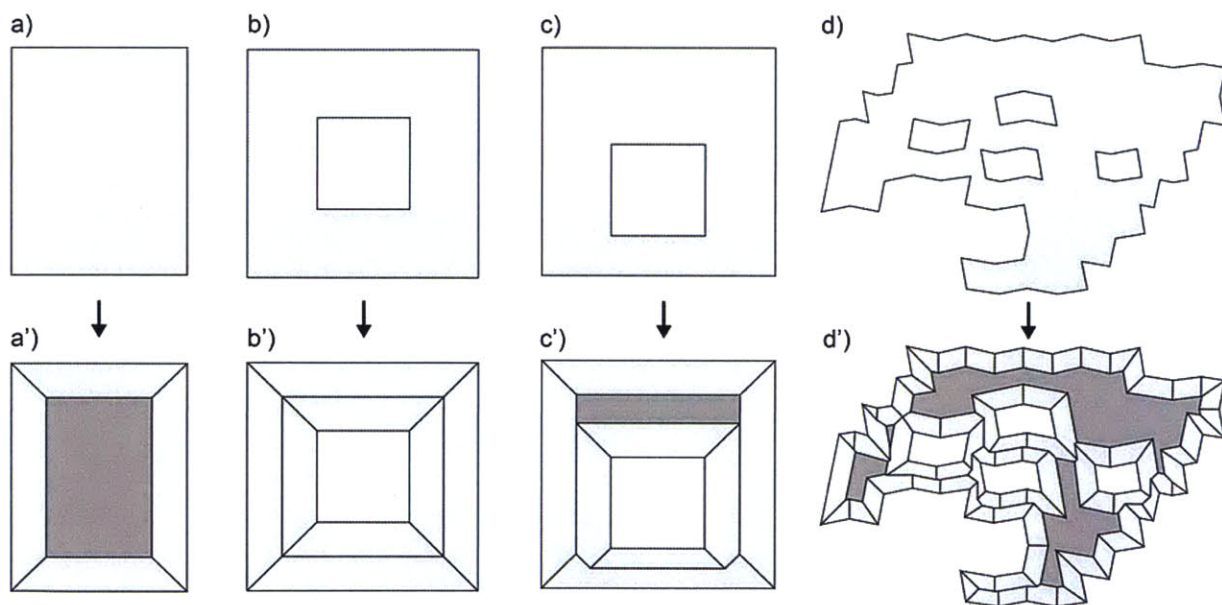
Floor plans zoned according to ASHRAE 90.1 Appendix G
